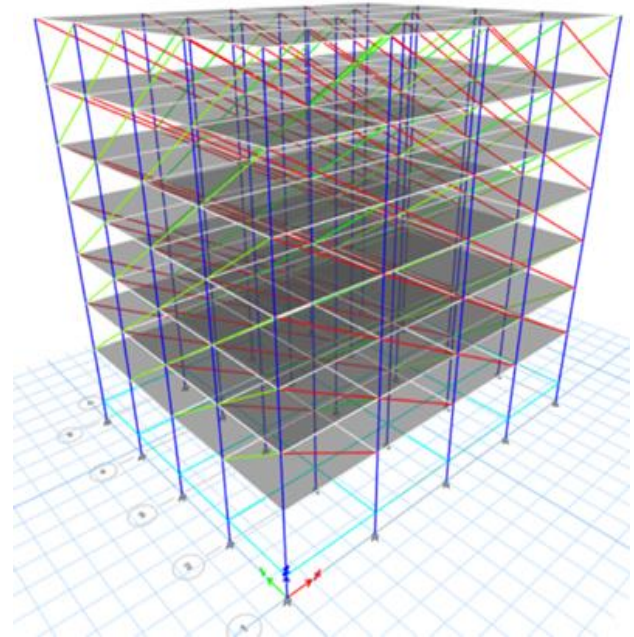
Infill with 230 & 115mm Wall Struts (Model 3 & 6)
